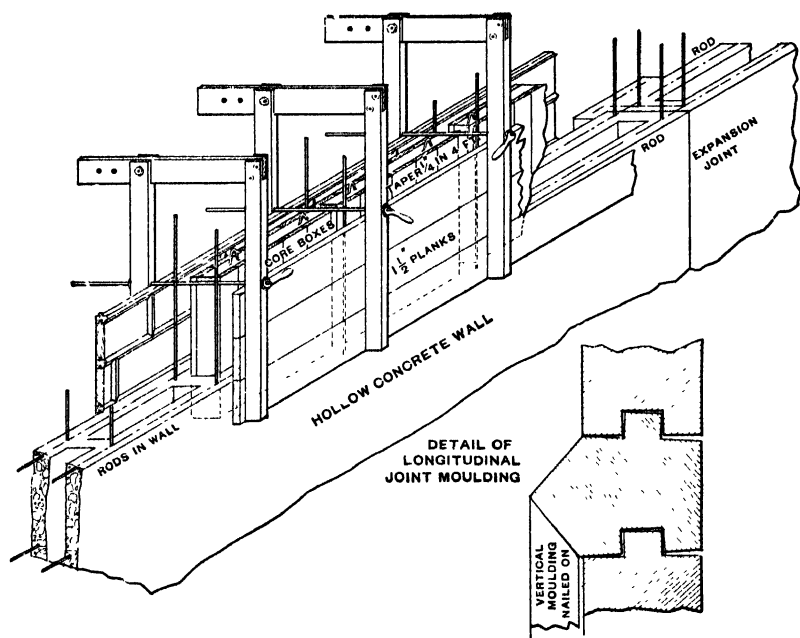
Forms for Hollow Walls. (See p. 657.)
